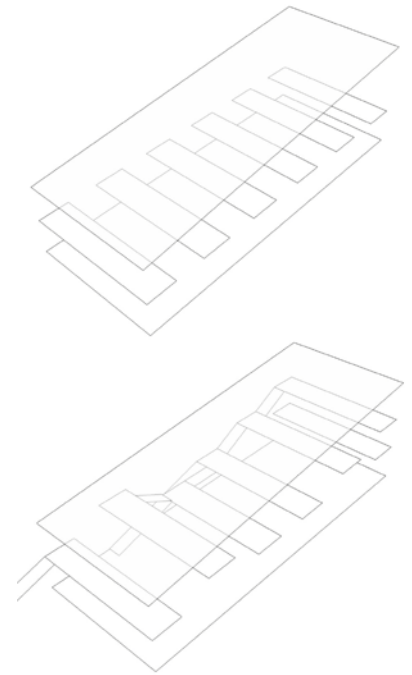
c-d : MTA Design Process, tilted floor allows different positions for bridges. Bridges are connected to the main floor and each other via ramps.
